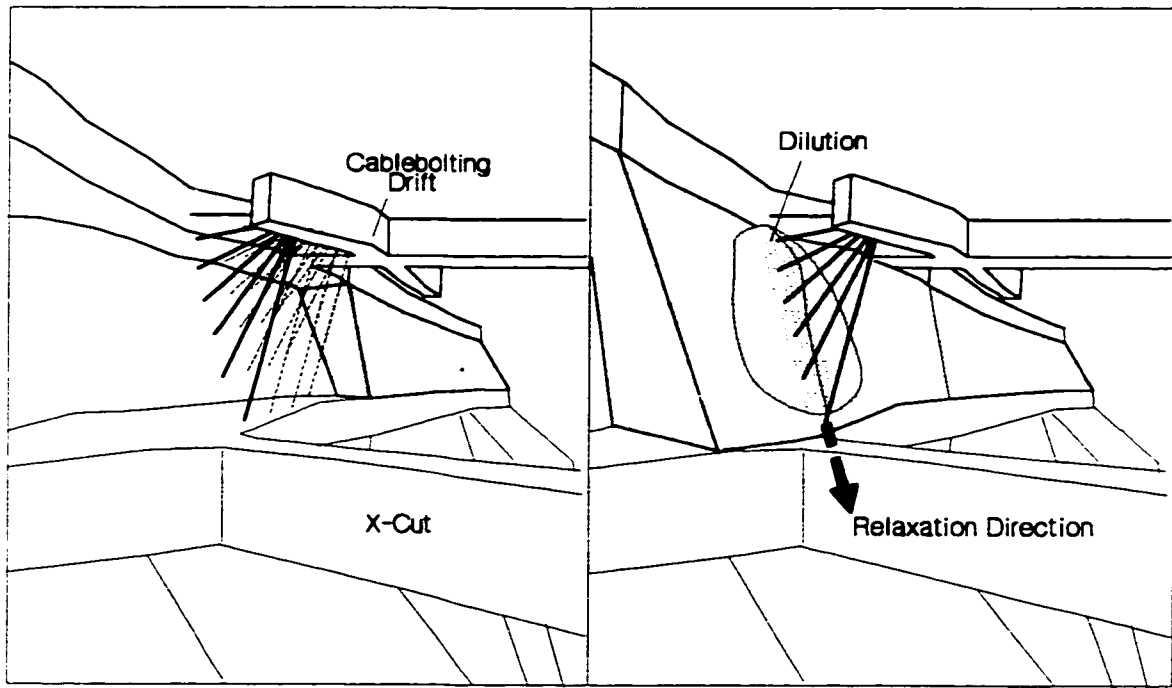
Failure of jointed hangingwall due relaxation of lower abutment above crosscut (modified after Hutchinson and Diederichs 1996).
